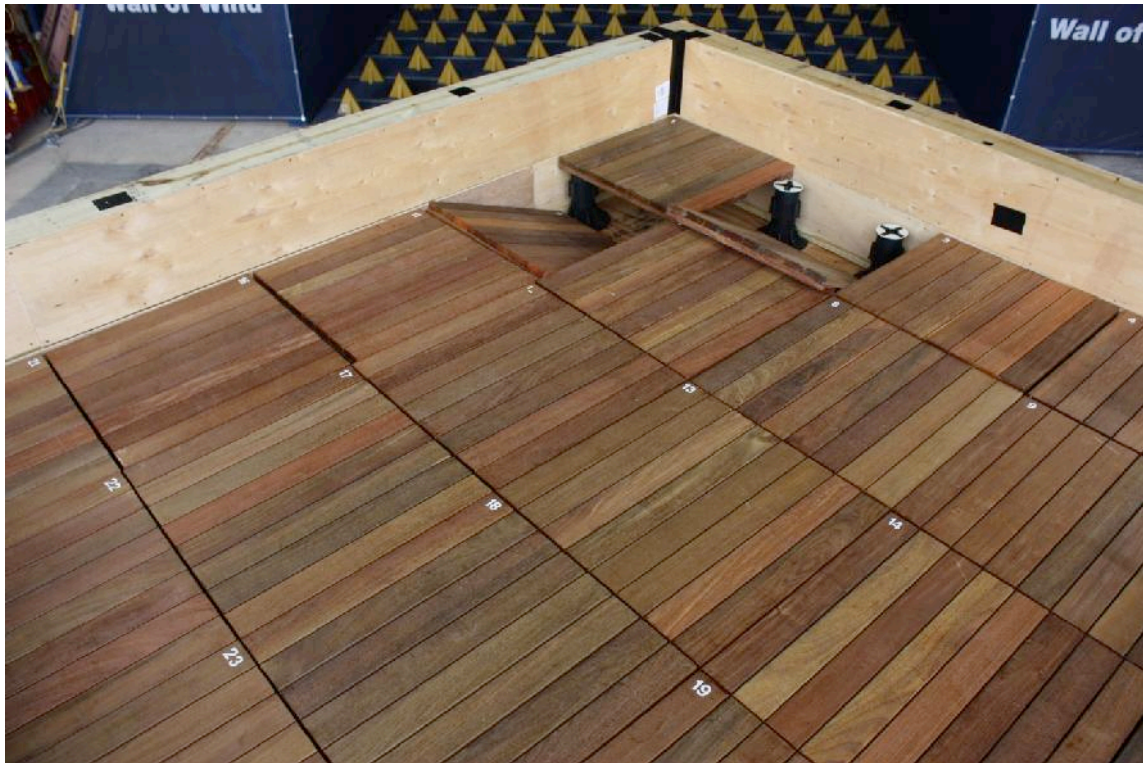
Pavers picked up by the wind and shifted down. Wind angle is 45 degrees.
